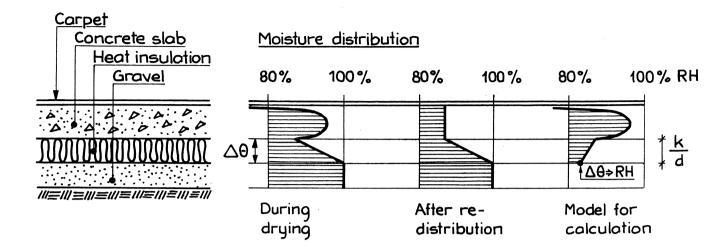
The floor structure and moisture distribution of a concrete slab with an underlying heat insulation directly on the ground.
